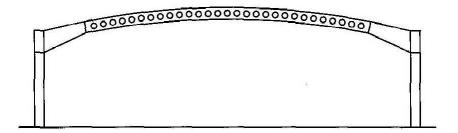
Tapered section portal frame (NZS 3404 part 1, 2019)
